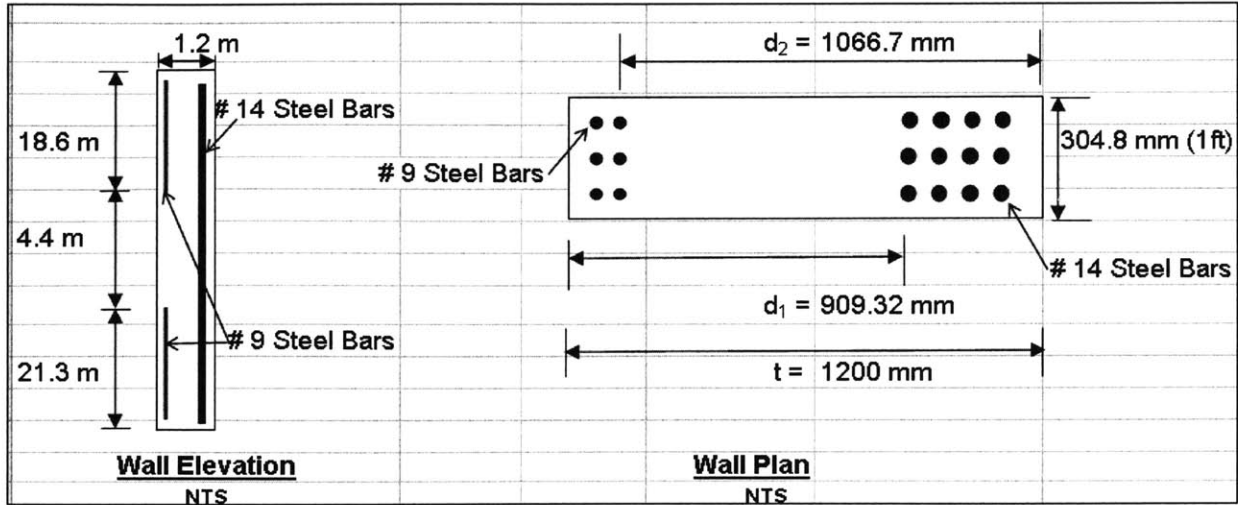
Sketch of Proposed Reinforcement for Diaphragm Wall (Plan and Elevation)
